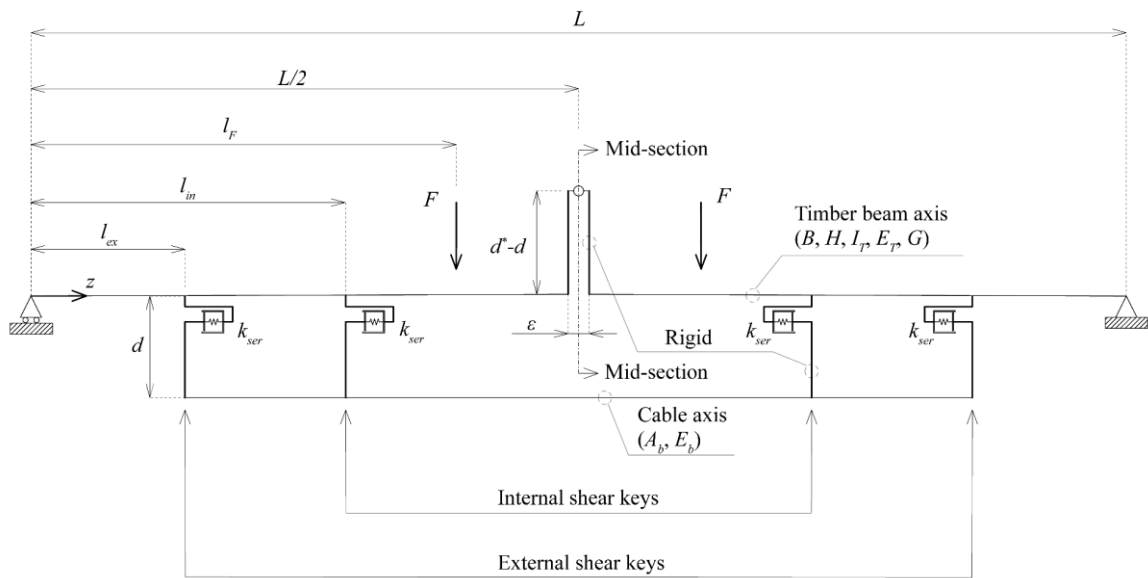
Global mechanical model of the composite timber-steel structure used to define the analytical model.
